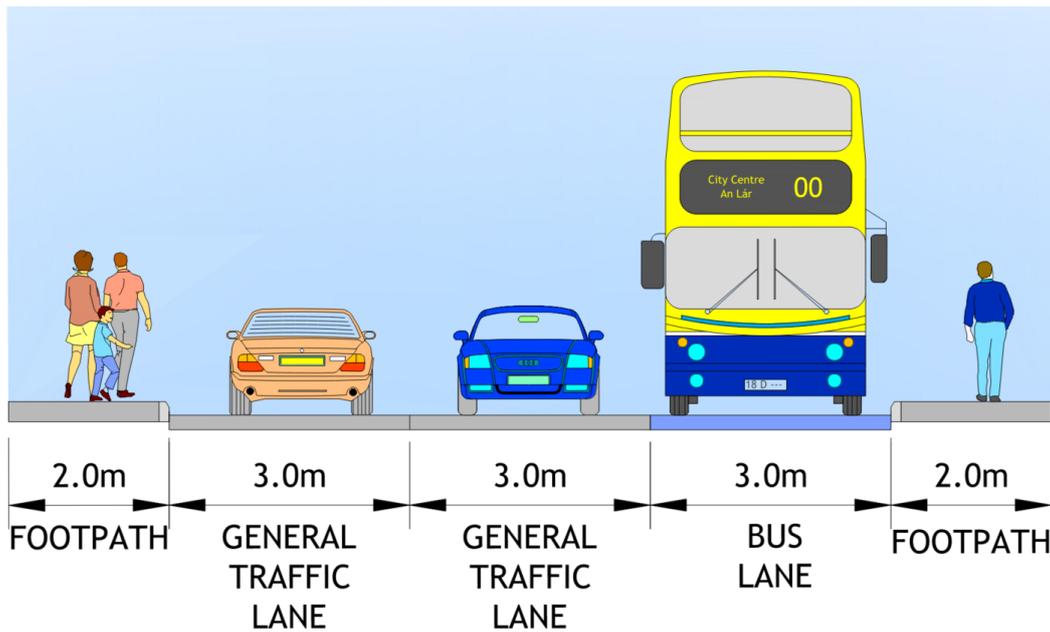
Cross-Section C-C (Relevant to RF9)
